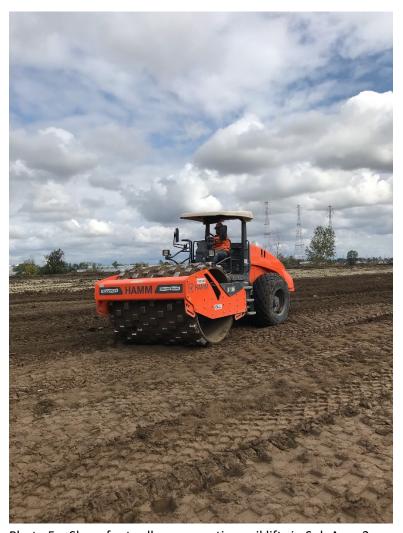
Sheepfoot roller compacting soil lifts in Sub Area 2
